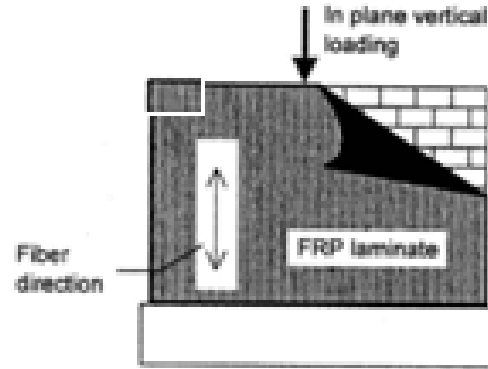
Reinforcement with FRP laminates for vertical loading of wall
